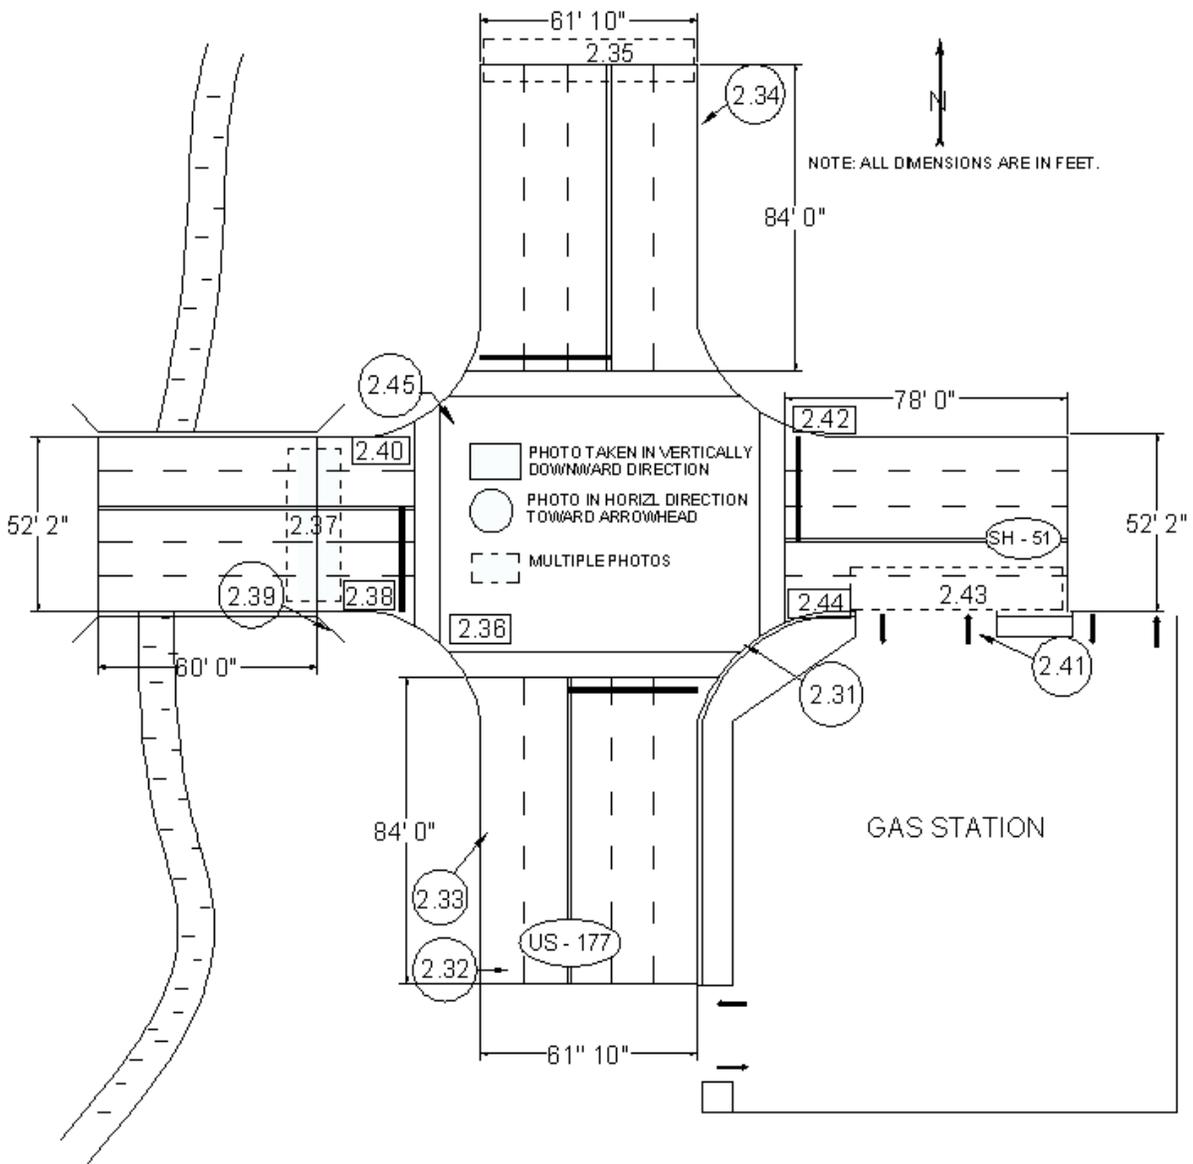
Layout of the intersection of US – 177 and SH – 51 depicting the location where the photographs were taken.
